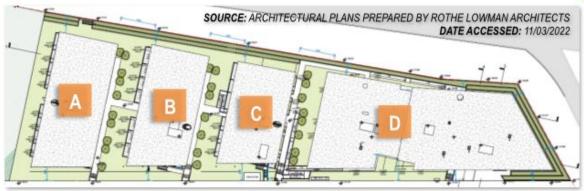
SITE PLANS AND BUILDING LAYOUT
